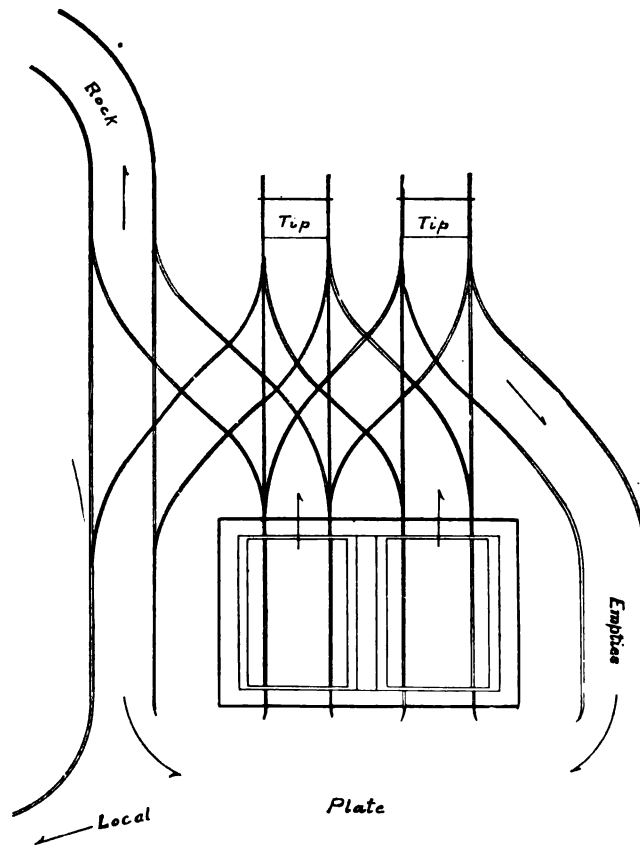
Diagram showing arrangement of tracks and switches in the Whitebreast tippie.
